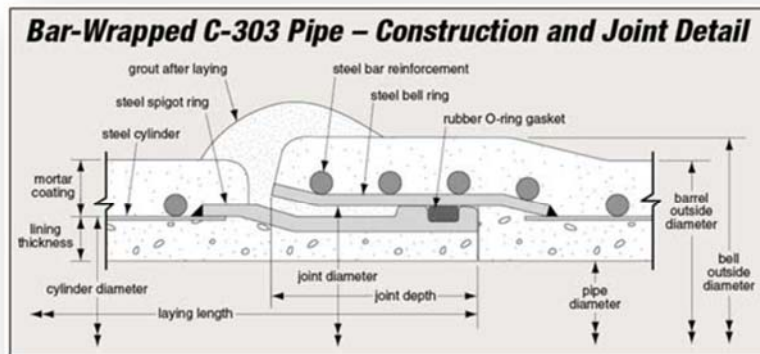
AWWA C303 Bar Wrapped Pipe Construction Details [3]
